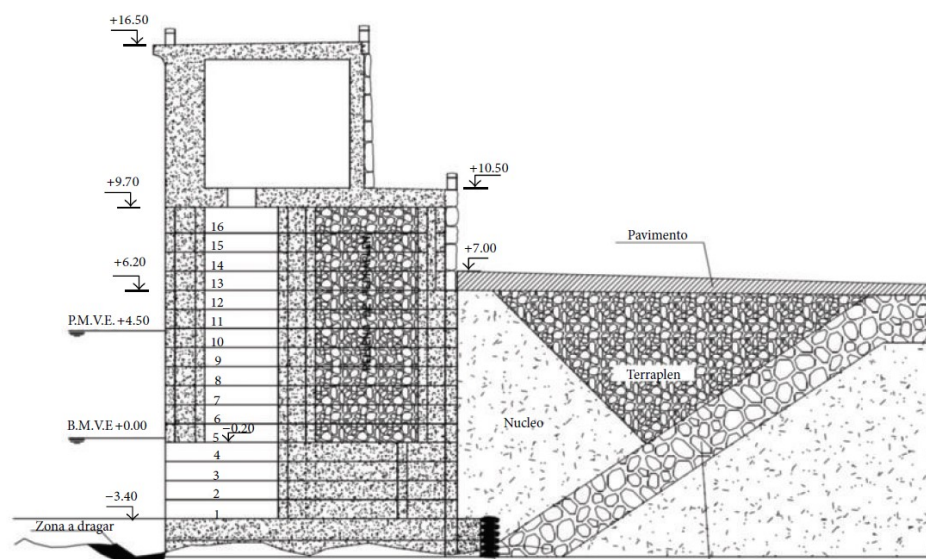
Chamber construction plan of the Mutriku power plant. Units are in metres. Image taken from Ref. [15] “Garrido, A.J.; Otaola, E.; Garrido I.; Lekube, J.; Maseda, F.J.; Liria, P.; Mader, J. Mathematical Modeling of Oscillating Water Columns Wave-Structure Interaction in Ocean Energy Plants. *Math. Probl. Eng.* 2015, 727982”. Copyright 2015 Author(s), licensed under a Creative Commons Attribution (CC BY 4.0) license.
